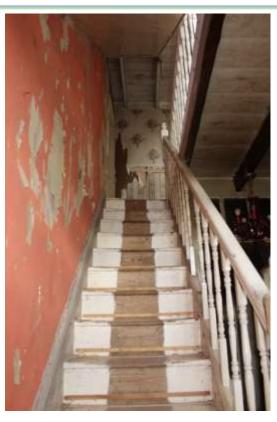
Internal view NNW showing ground floor staircase within the farmhouse – Building No. 1
